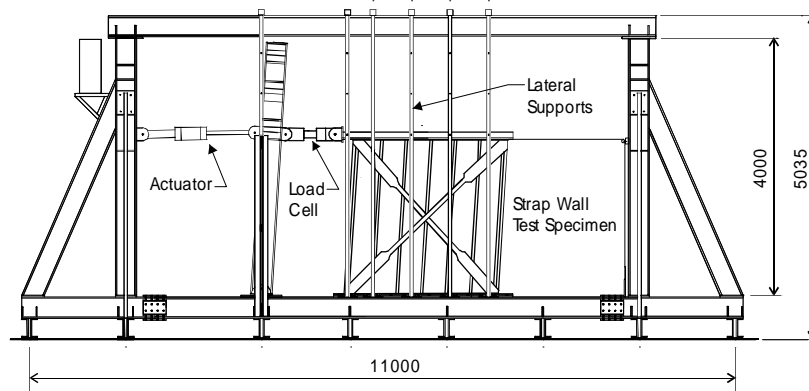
Schematic drawing of displaced 2440 × 2440 mm strap braced wall specimen in test frame
